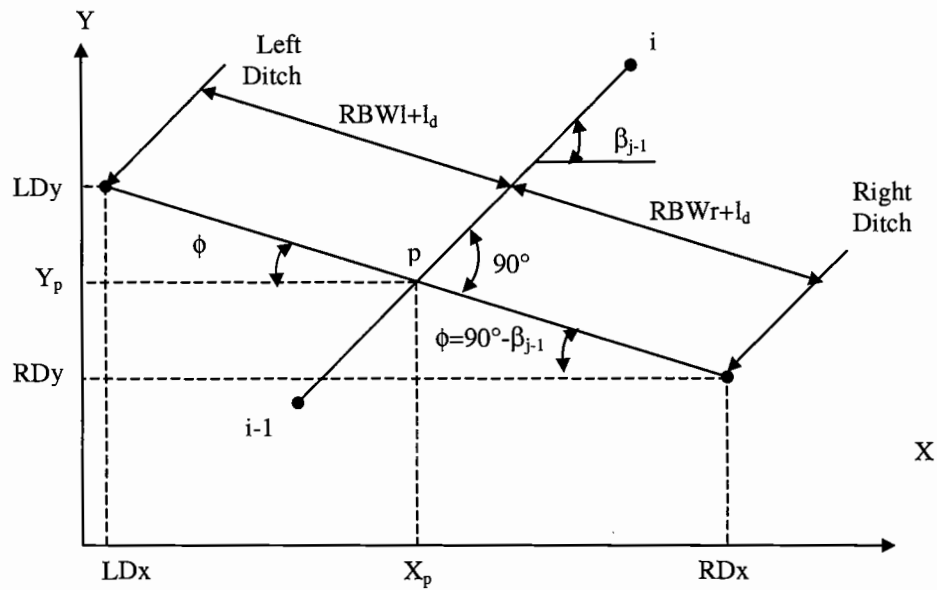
Geometry of a cross section on a straight roadway (tangent).
